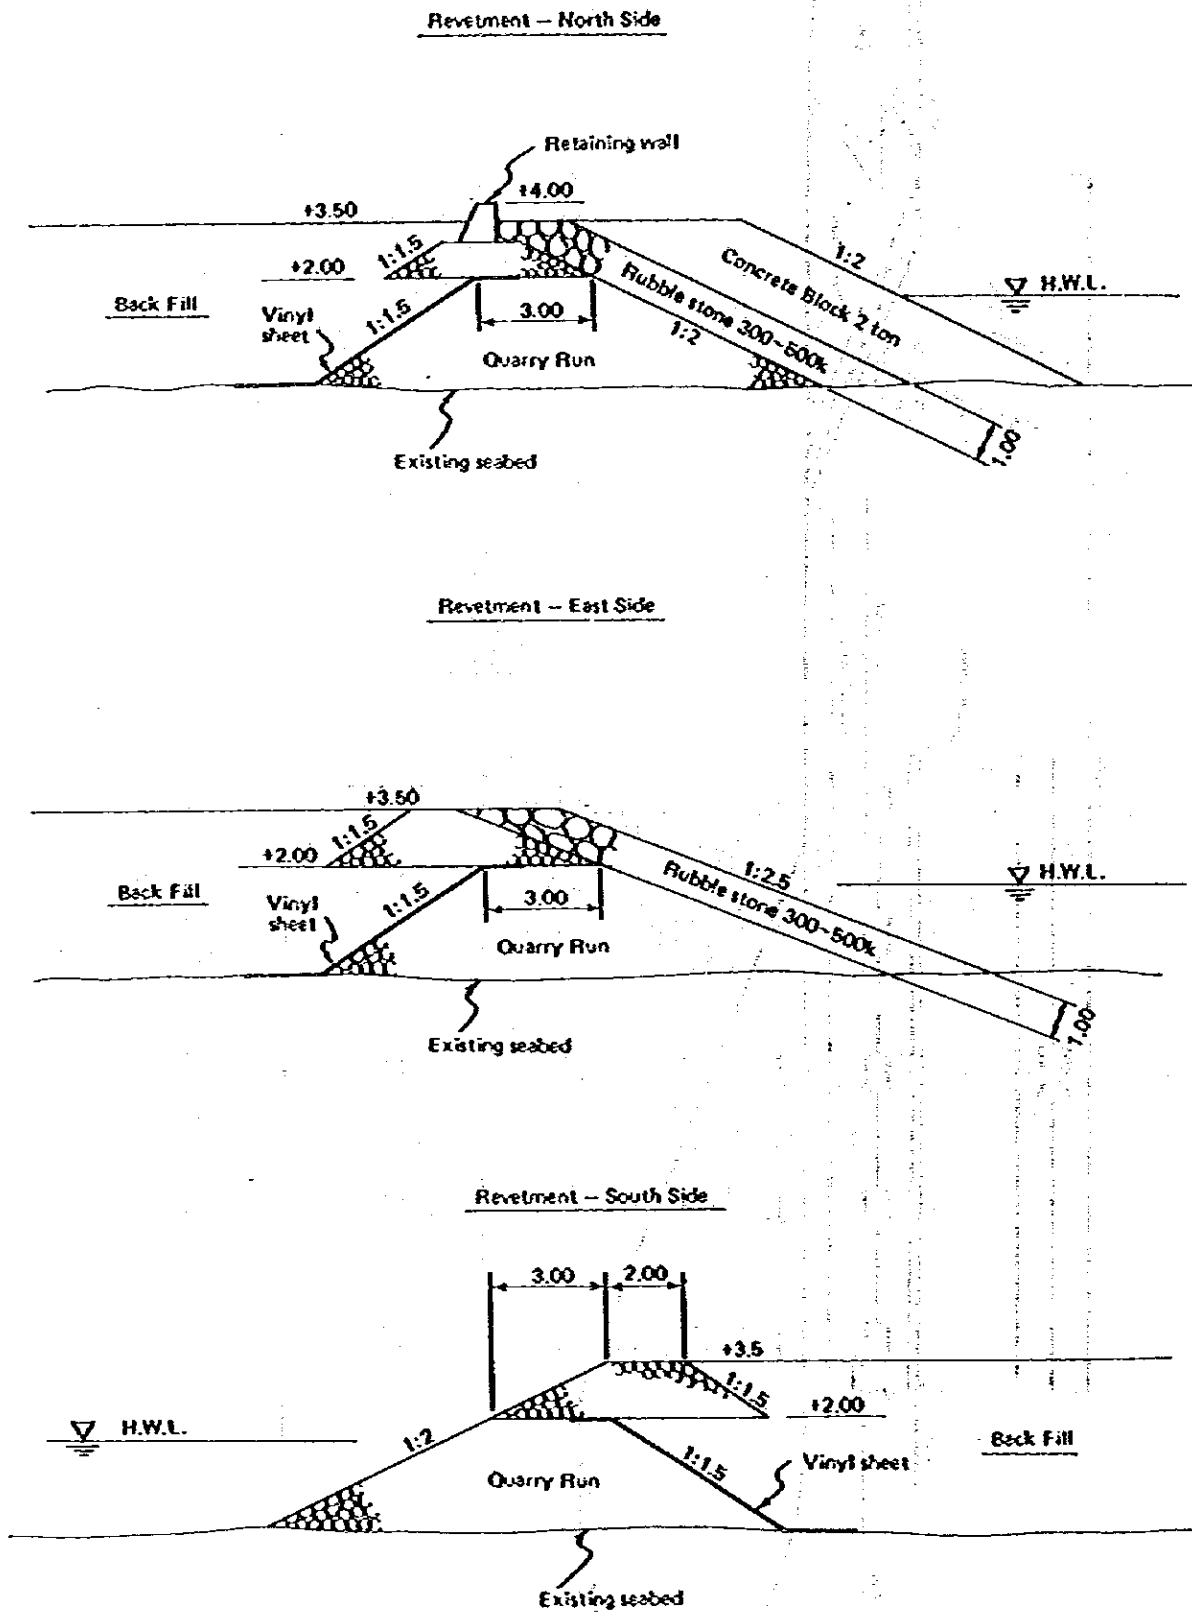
Typical Cross Section of Revetment (T-Head Type)
